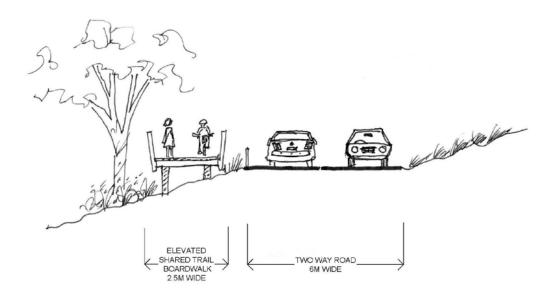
Typical cross section of Option B: Retaining the two-way road and providing a shared trail on a boardwalk western side (downslope) of Lake Street.
